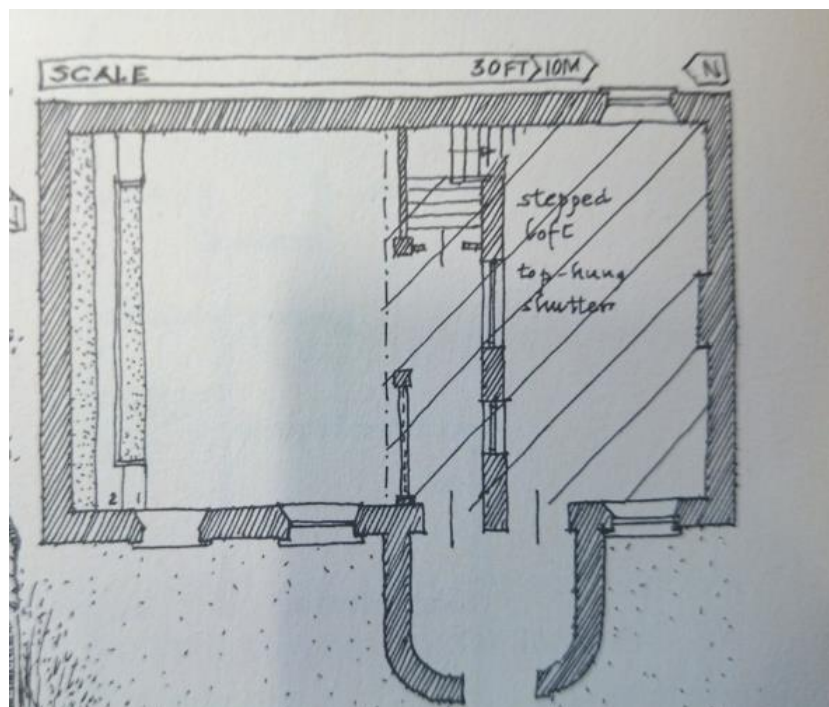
Ground floor plan of the meeting house as reconstructed by Butler (north at the top; not to scale) (Butler (1999), vol. 1, p.296)
